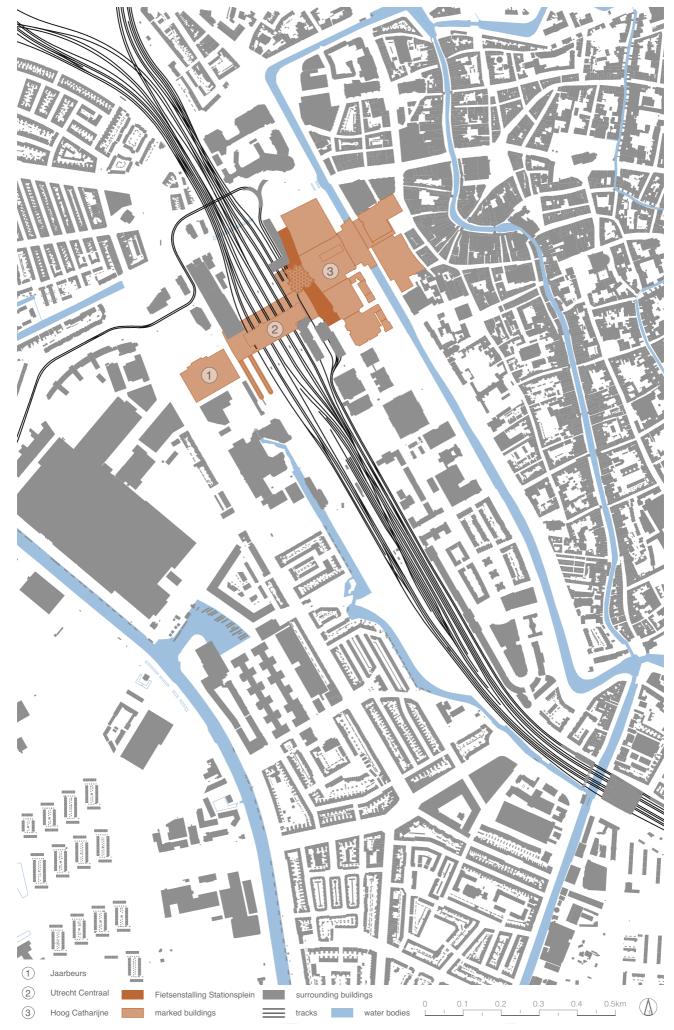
Site plan city of Utrecht with marked project area, scale 1:10.000
